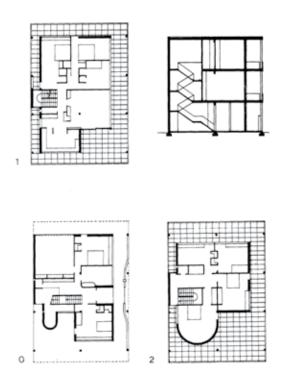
Villa Baizeau plans and section (source: Risselada 1989: 117).
